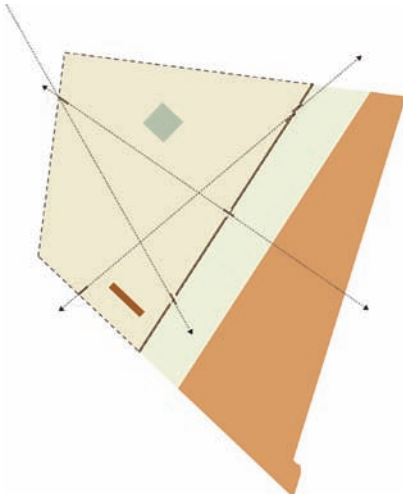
On typical days, certain panels will be pivoted open to encourage pedestrian shortcuts through the site.
